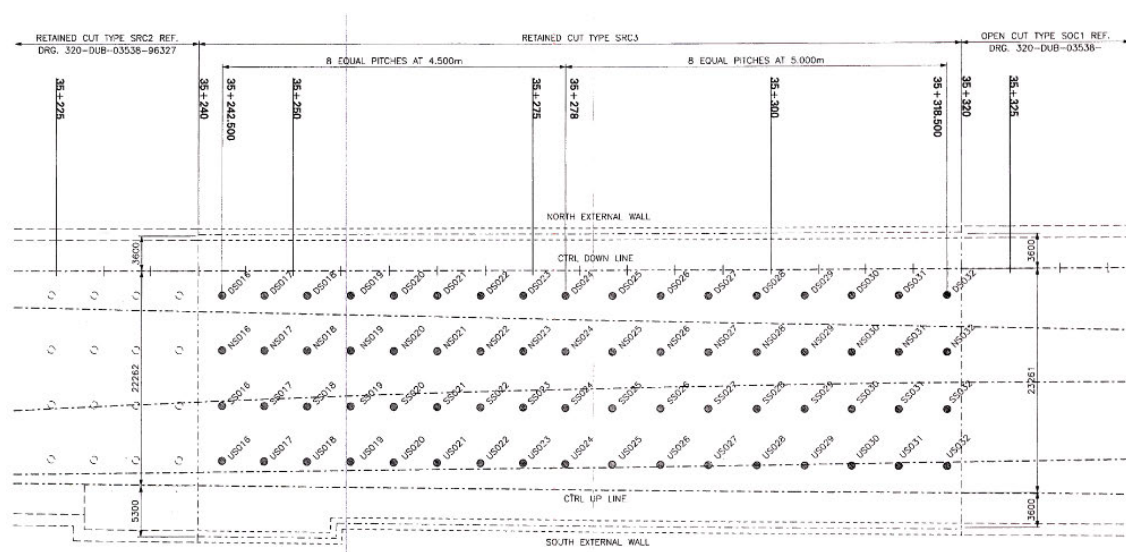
General Arrangement of Existing HS1 Infrastructure
